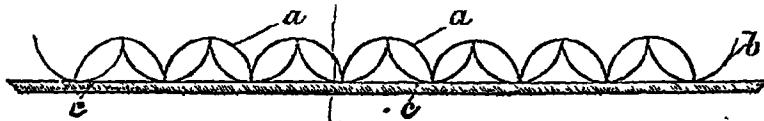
is a cross-section (diagrammatic) through a tiled roof to show the arrangement of the tiles. a, a are pan tiles placed convexly; b, b are pan tiles placed concavewise; c, c are the flat tiles placed on the battens or the bamboo frame-work. (Drawn by A. W. Lushington.)
